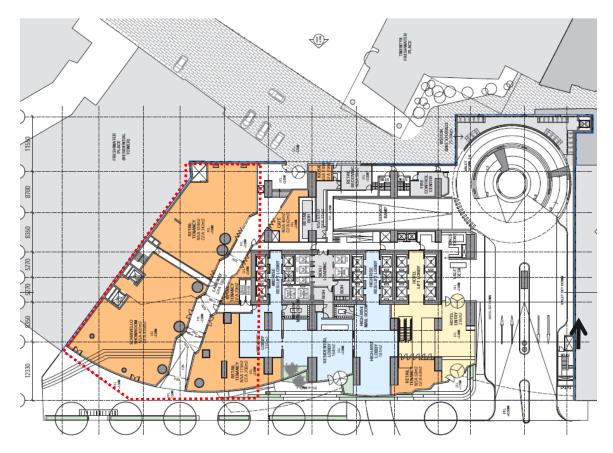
1- 29 Queens Bridge Street, Ground Floor Plan (Incorporated Document 2017 – Rev 1 3.2.2017) – approximate outline of 1-7 Queens Bridge Street shown in red.
